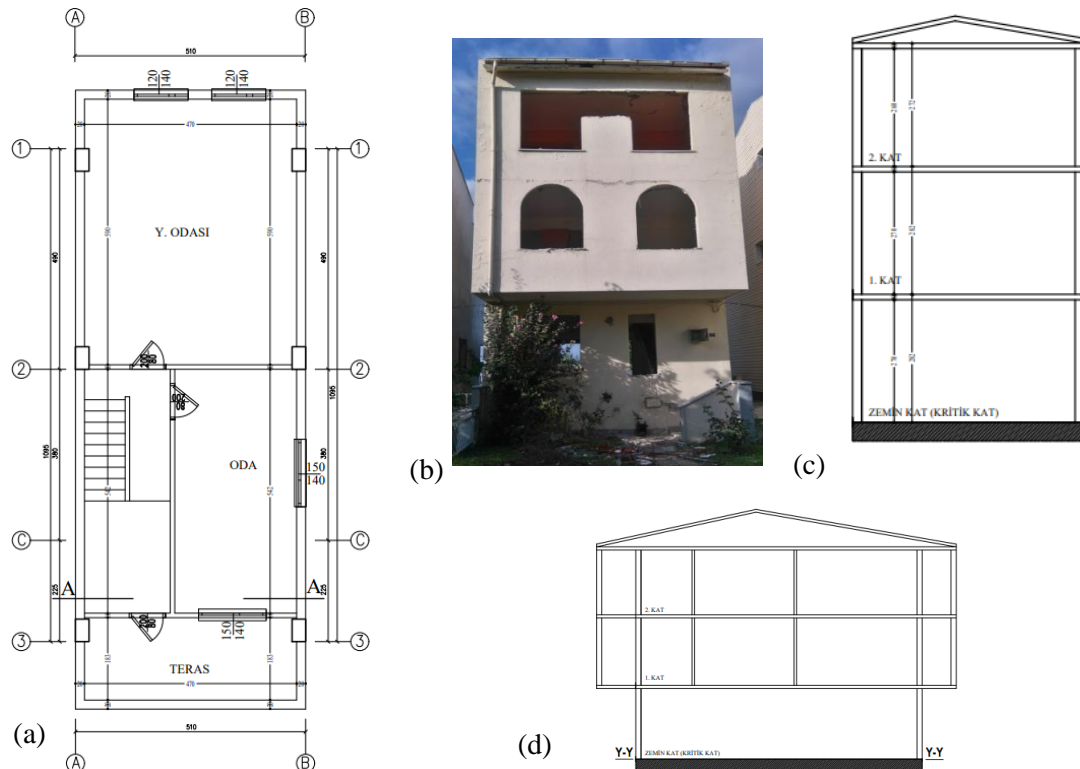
(a) Typical floor plan, (b) facade, (c) cross-section along the shorter direction, and (d) cross-section along the longer direction of the case study building.
